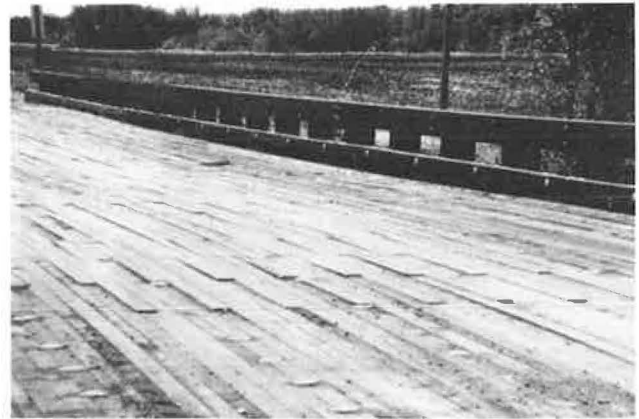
Deck with grouted, drilled recessed holes for composite action on a continuous 150-ft stressed-timber deck bridge.
